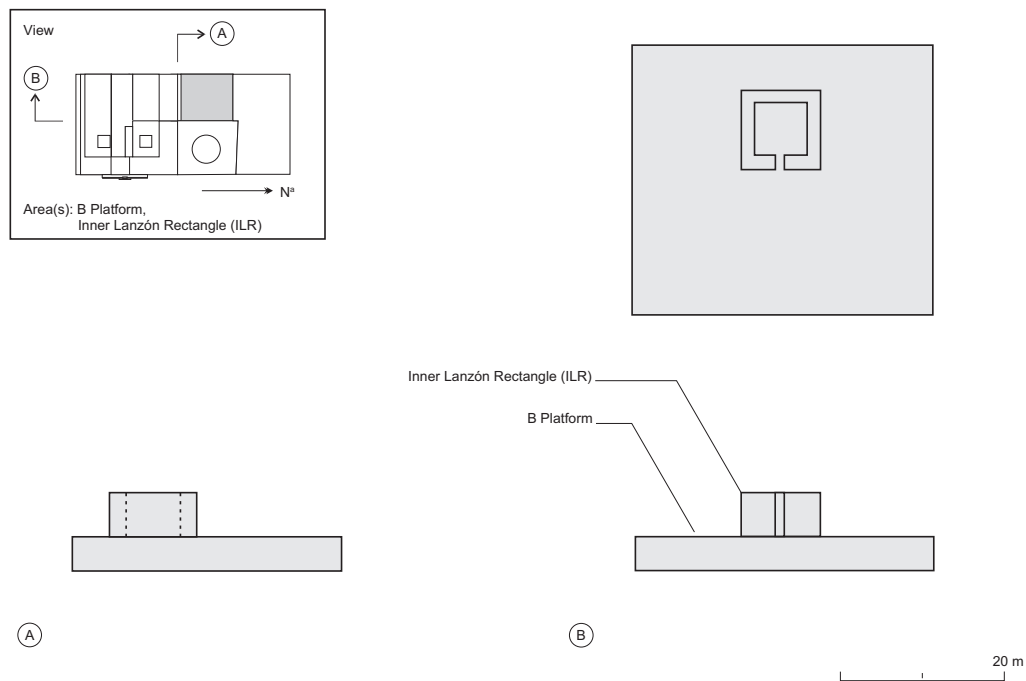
Building B Construction Phase 1: B Platform-ILR Phase; plan and architectural north (A) and west (B) profile views.
